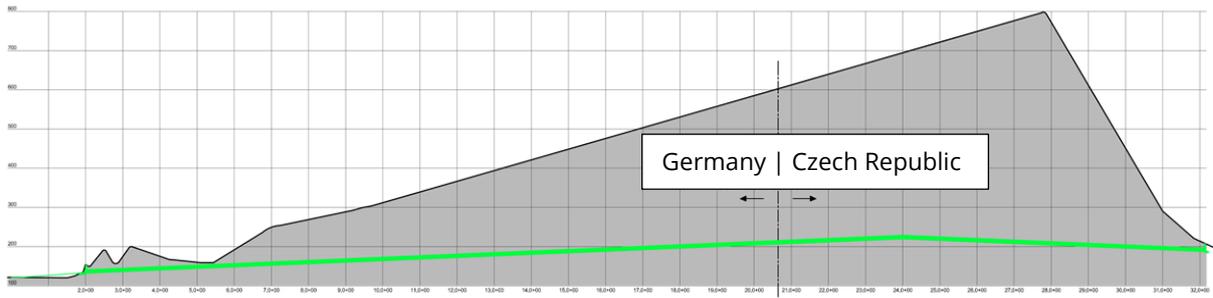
Overview longitudinal section of the tunnel in the Ore Mountains (Erzgebirgstunnel), [1] (edited)
